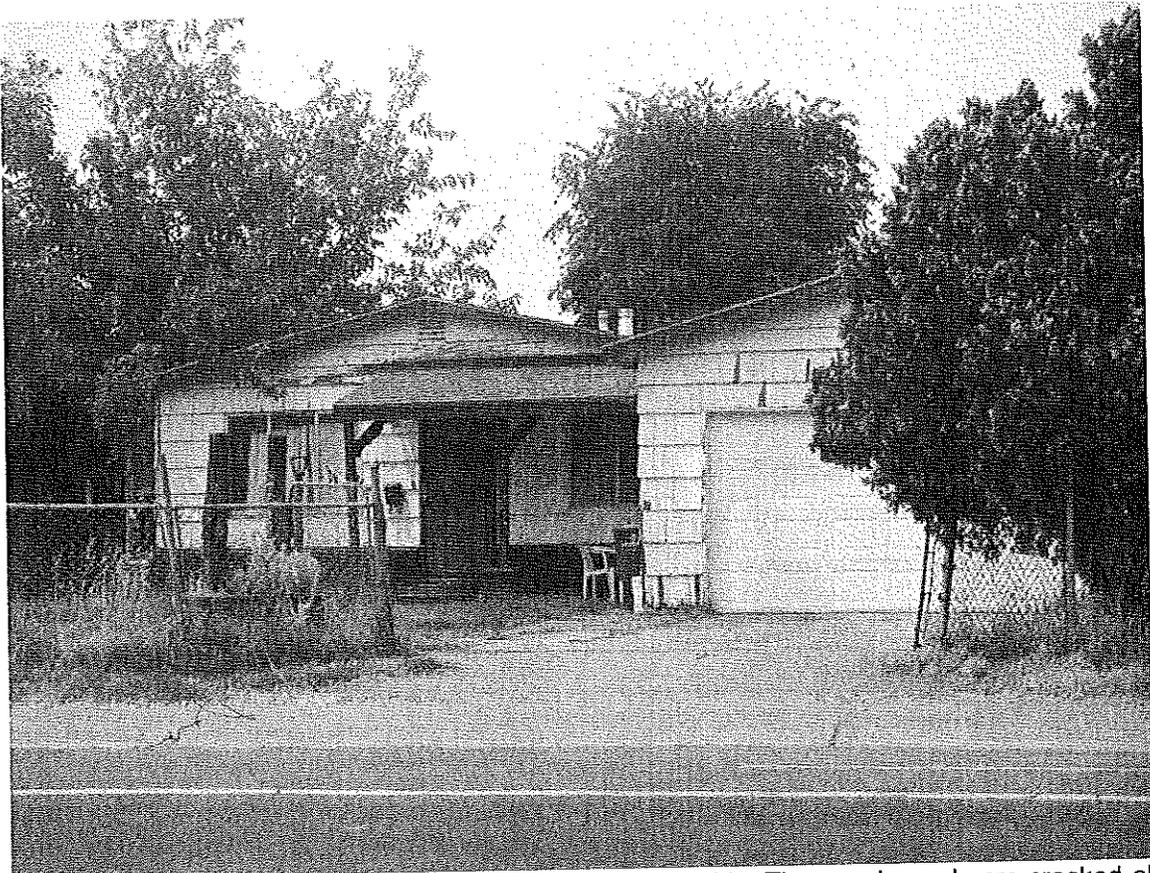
500 Block of Grand Avenue, APN 250 0063 022: The wood panels are cracked above the doorway and around the garage due to faulty weather protection and neglect. The left column holding the overhang above the door is beginning to buckle. Buckling vertical supports are a common code violation according to the City Code Enforcement Department.
